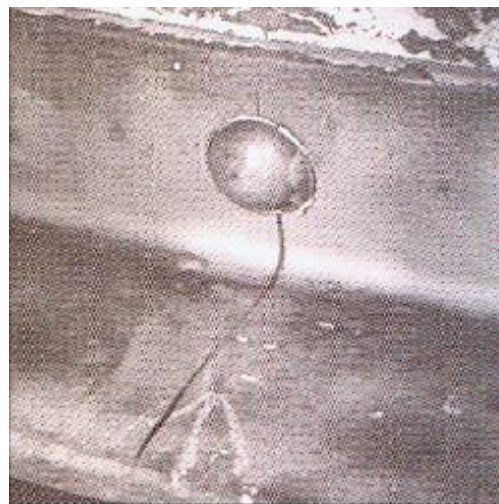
Fatigue cracking on either side of a rivet (Vermes, 2007)
